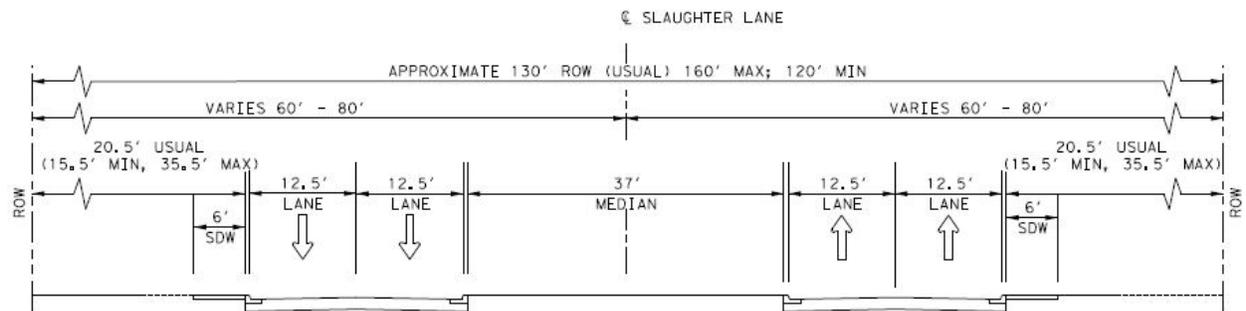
Escarpment Boulevard to MoPac Existing and Proposed Typical Sections
